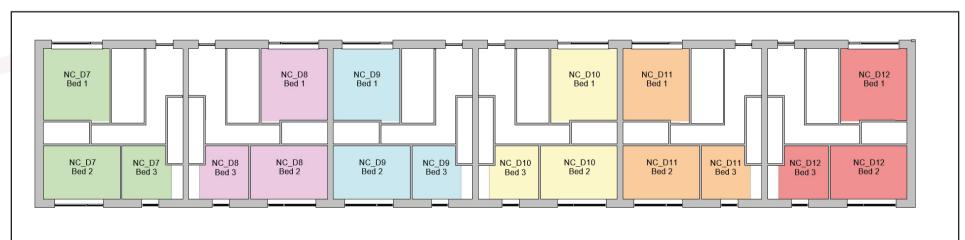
Floor plan of assessed building with keyplan highlighting the assessed building.
